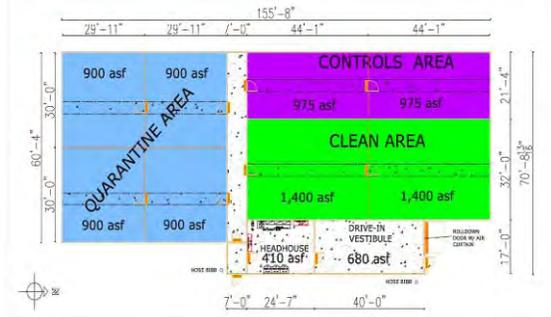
Proposed floor plan for a new quarantine CCPP screenhouse
